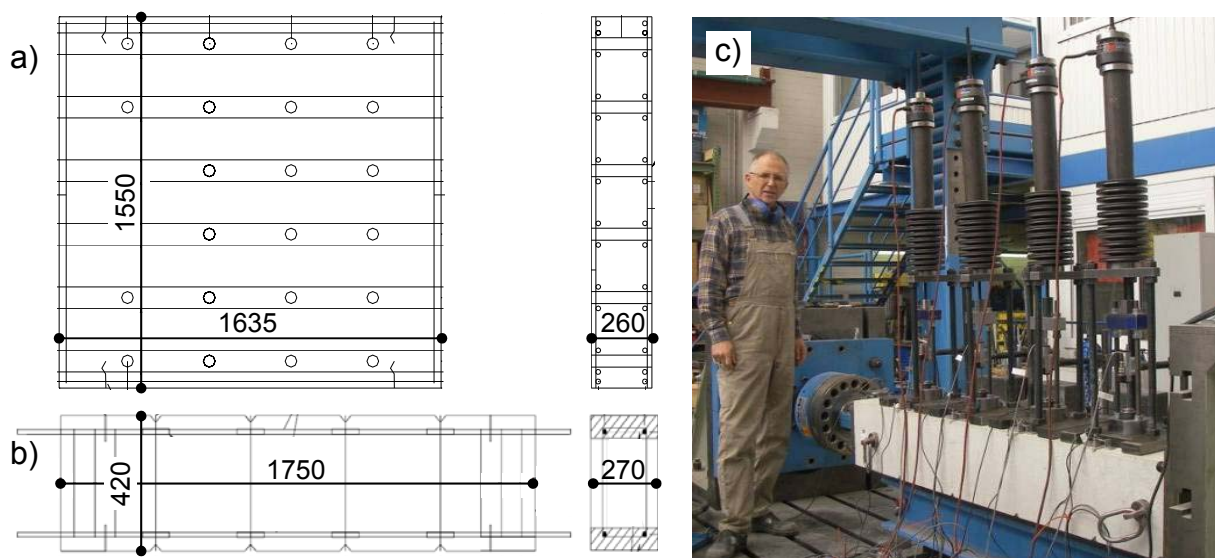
a) Wedge split concrete members; b) Strain concrete member; c) Setup 1<sup>st</sup> exploratory test program on crack cycling
